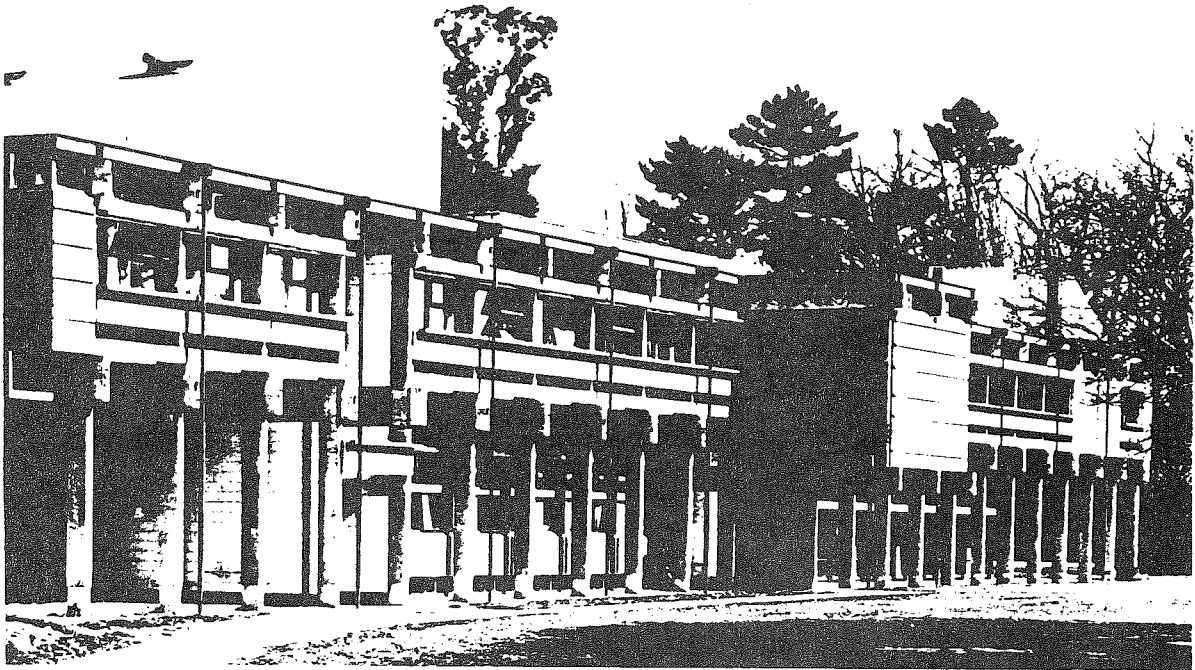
Precast Post-Tensioned Prestressed Concrete Building Frames (Students Association, University of Canterbury, New Zealand).
